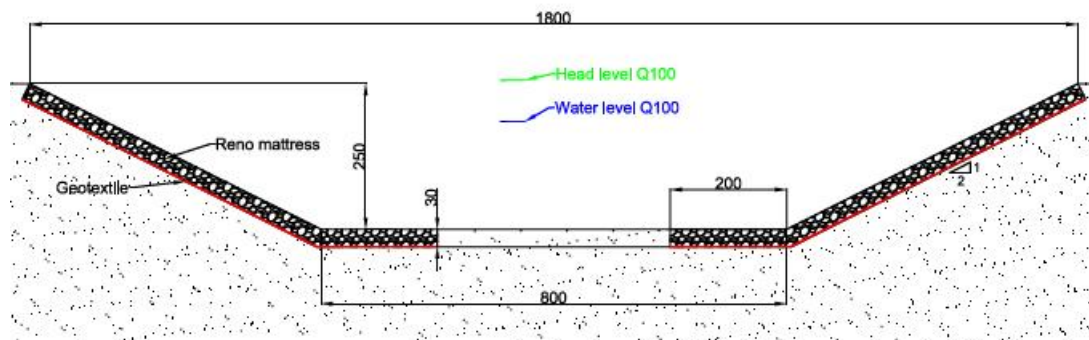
Typical trapezoidal cross section – Q100 = 80 m³/s – Lengths in cm
